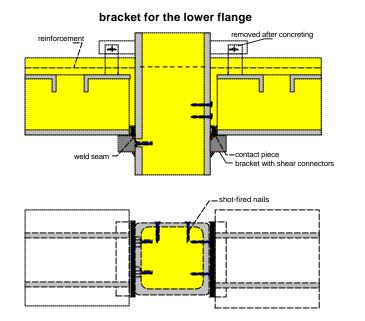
Example for the vertical shear transfer between beams and composite columns [1]
